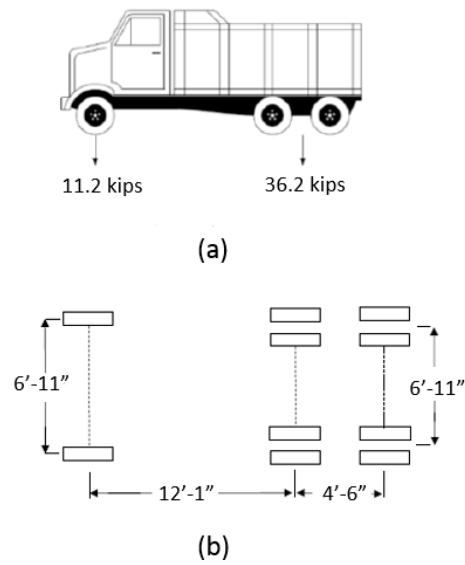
Truck weight (a) and dimensions (b) of truck used for LL test 3
